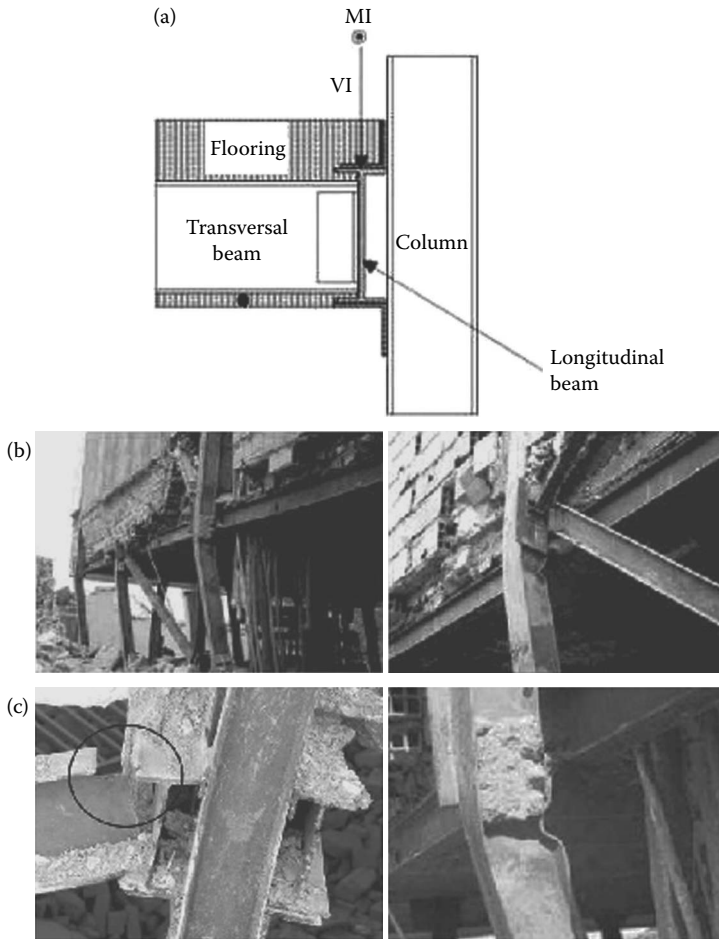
Steel structure erected in Iran: (a) beam-to-column end-span connection of Khorjini type; (b) collapse of braced frame; (c) connection failure. (After Zahrai, S.M., Heidarzadeh, M. 2004: *13th World Conference on Earthquake Engineering*, Vancouver, August 1–6, Paper No. 1715.)
